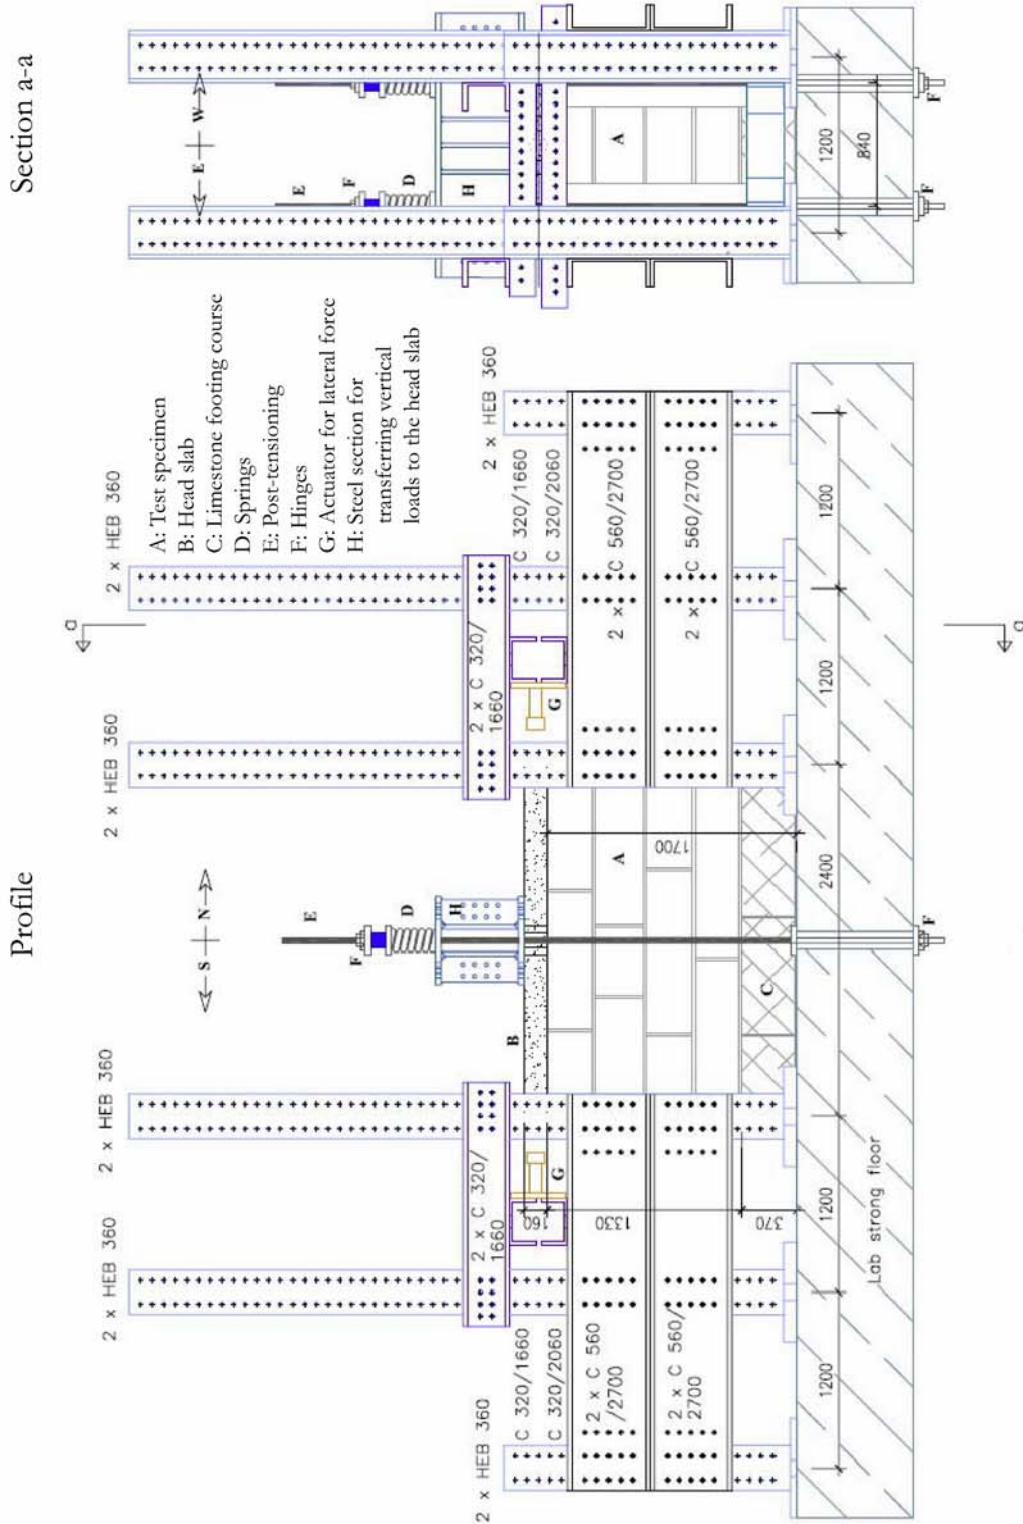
Test set-up [Fa 07] (dimensions in [mm]).
